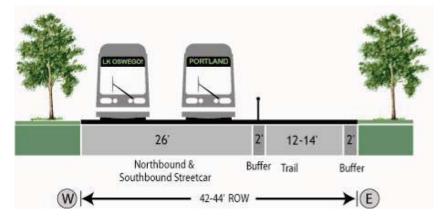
Section 1.0a Willamette Shore Line with Double-track Streetcar
